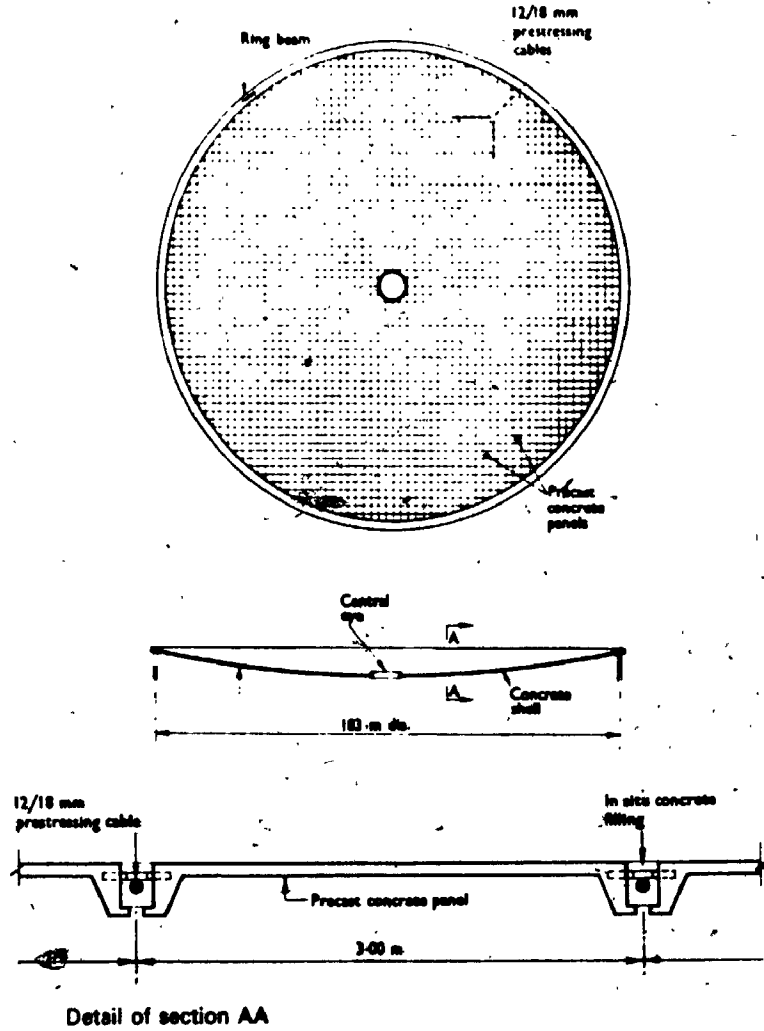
Concrete Panels Suspended Between Cables
